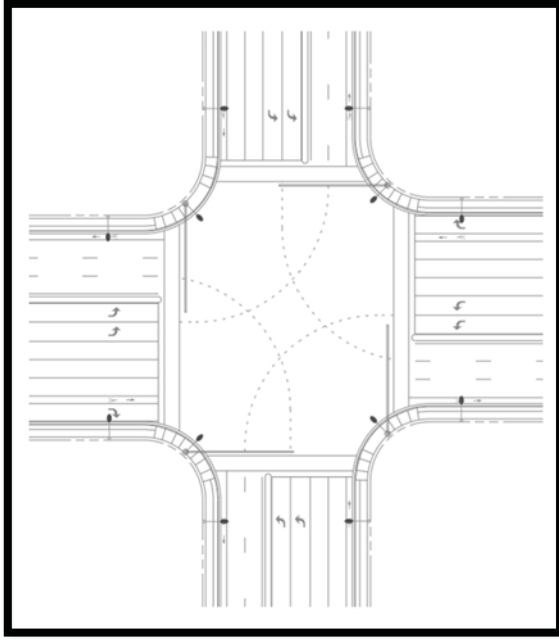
Typical Urban Signalized Intersection Lighting Design (FDM Figure 231.3.4)
